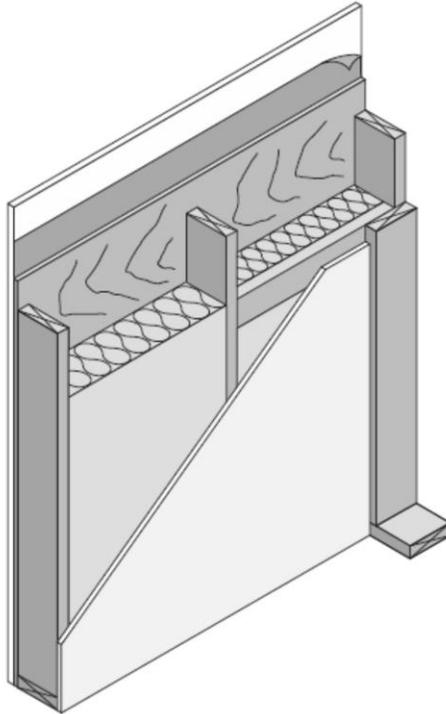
x.x - Wood Framed Wall 2x6 24" o.c., AWF, 2 stud corner
